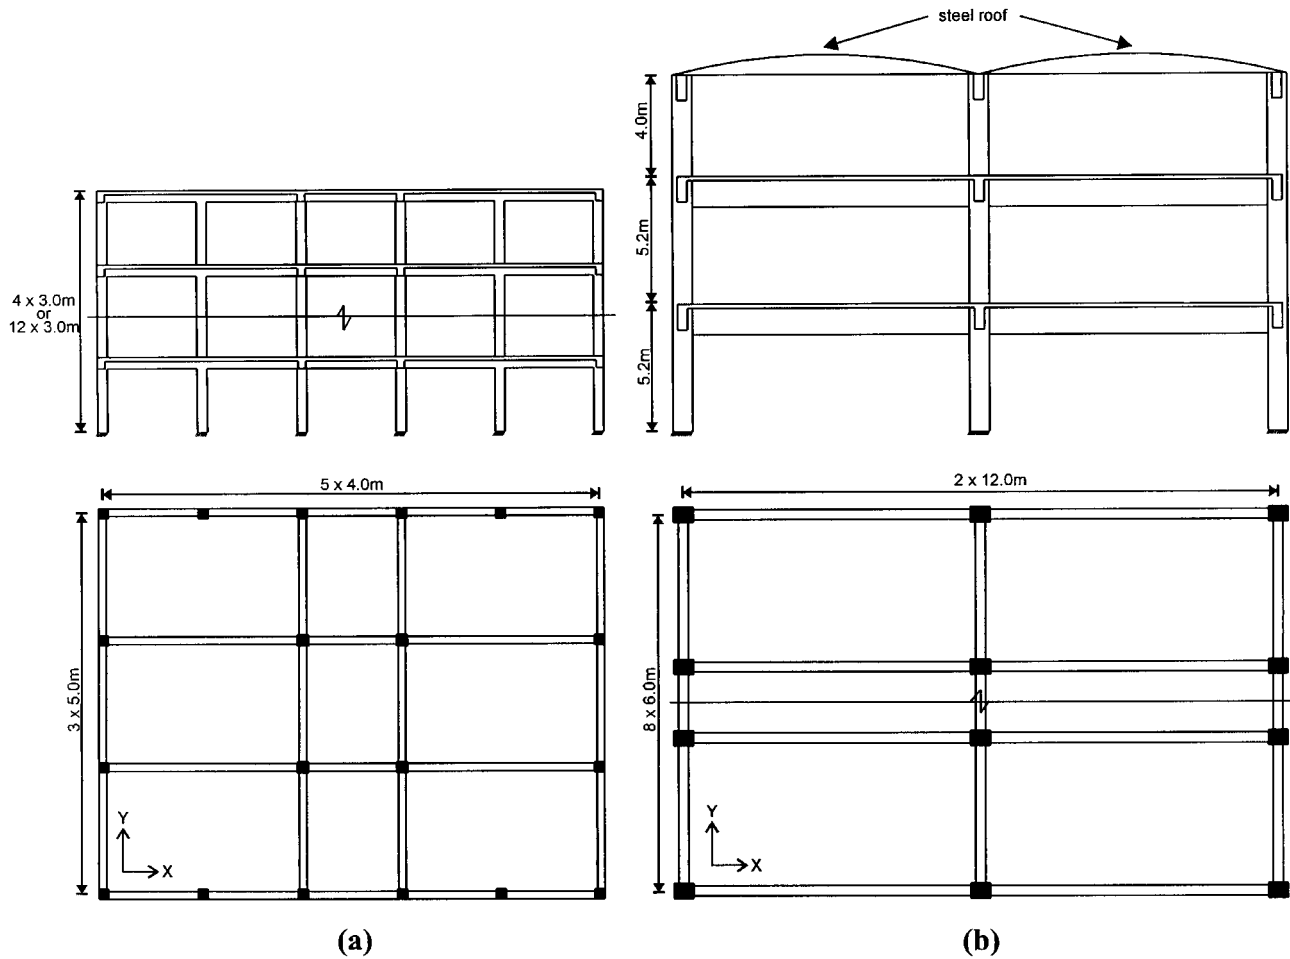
Plane and vertical section of buildings: (a) four-storey and 12-storey buildings; (b) three-storey buildings
